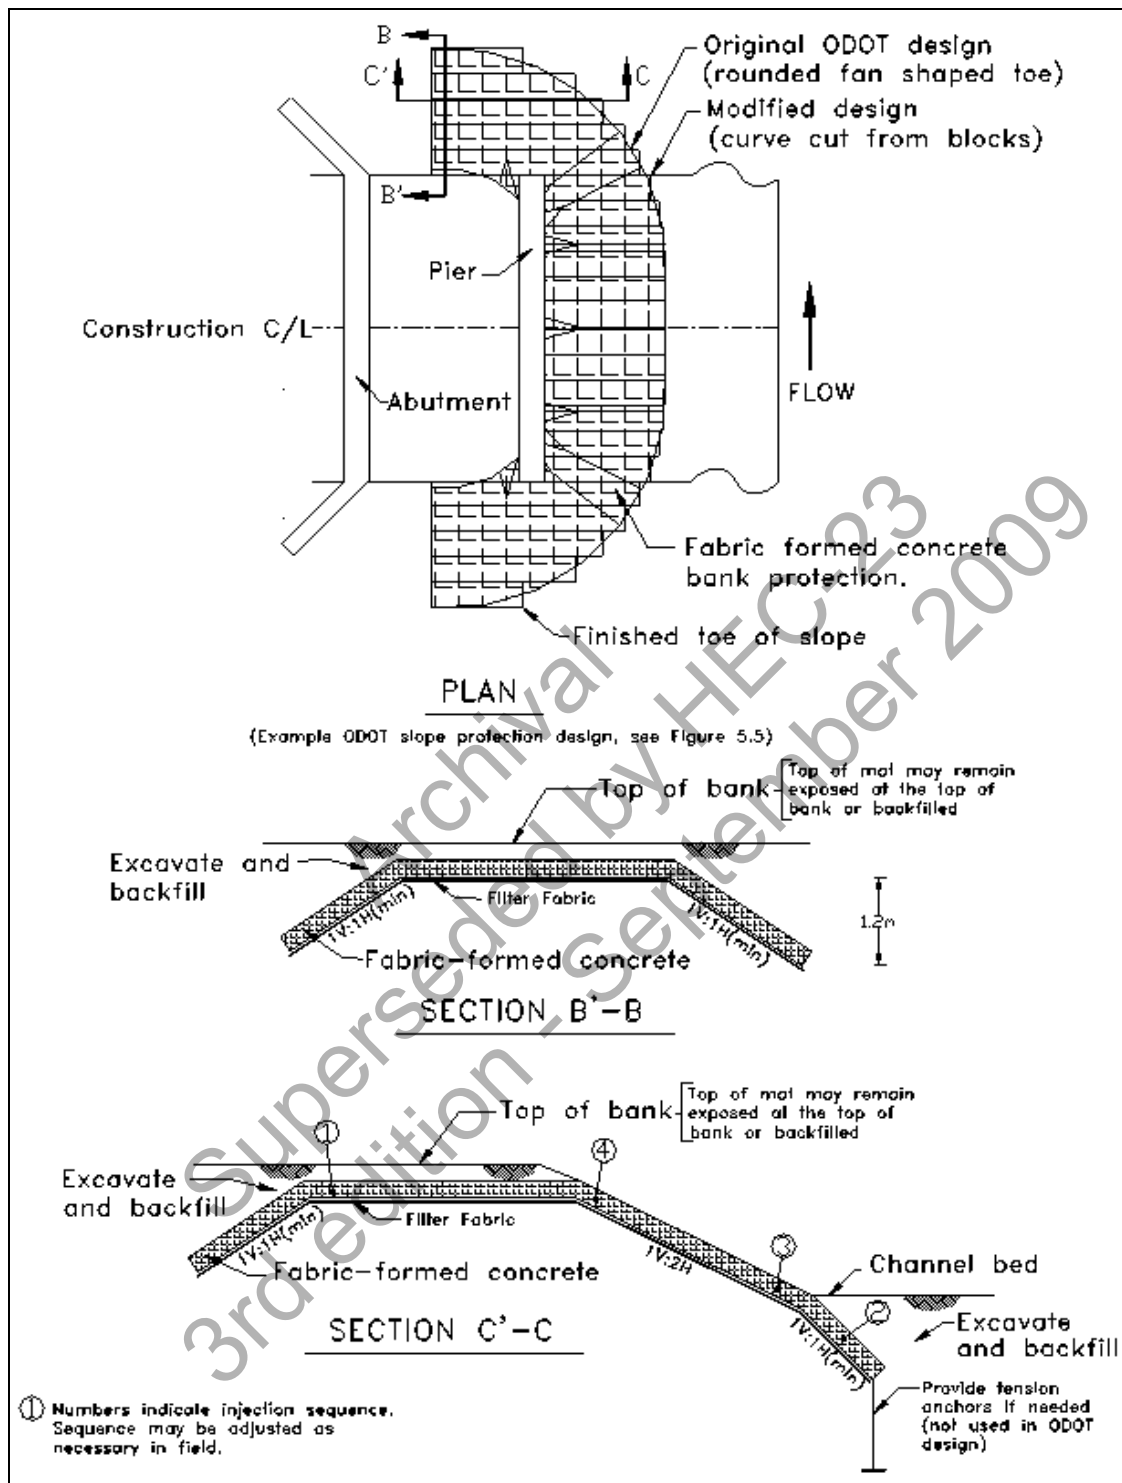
Typical articulated grout filled mat design.^(6,7)
